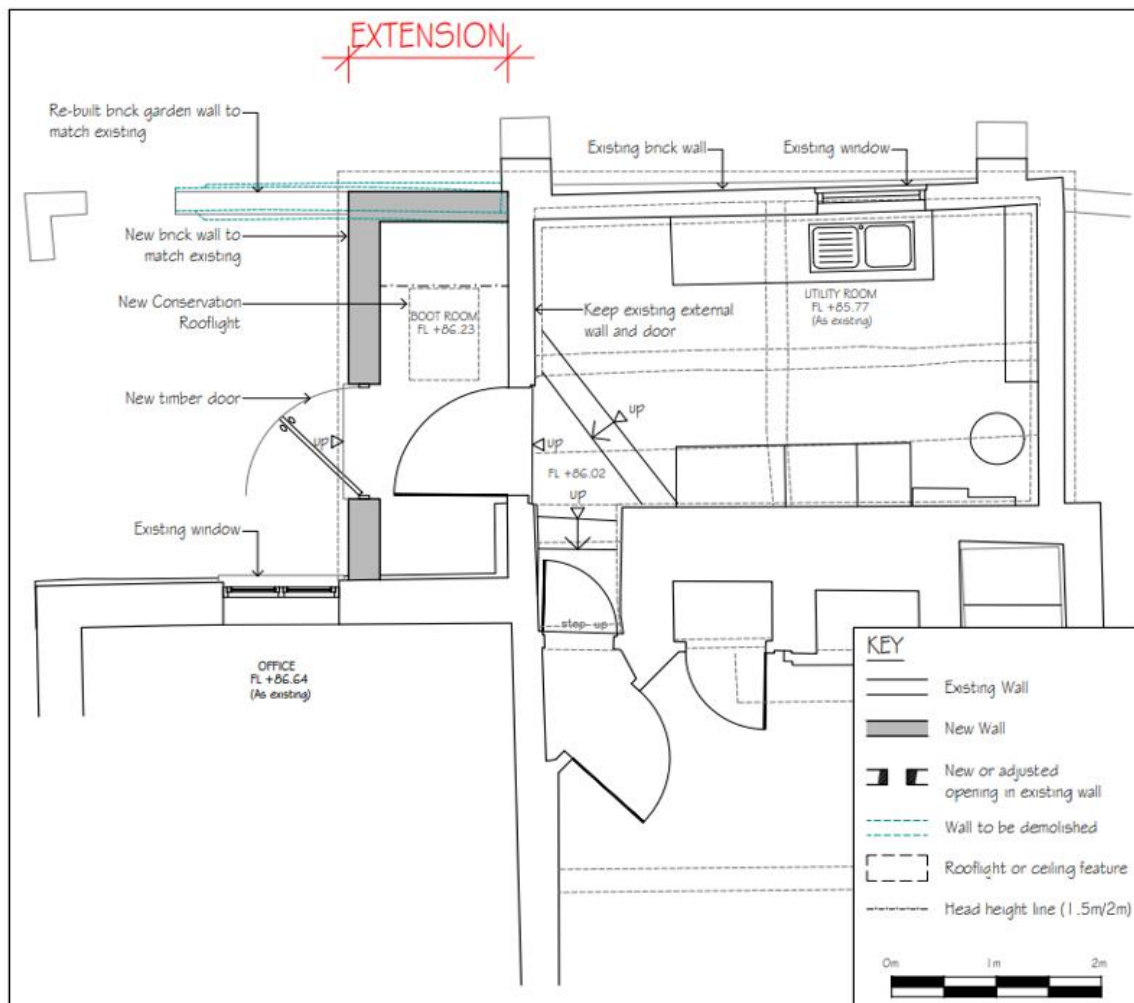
Ground-plan, showing the proposed boot room extension and existing plan-form on the south-western side of Church Farm House (Fowler Architecture and Planning).
